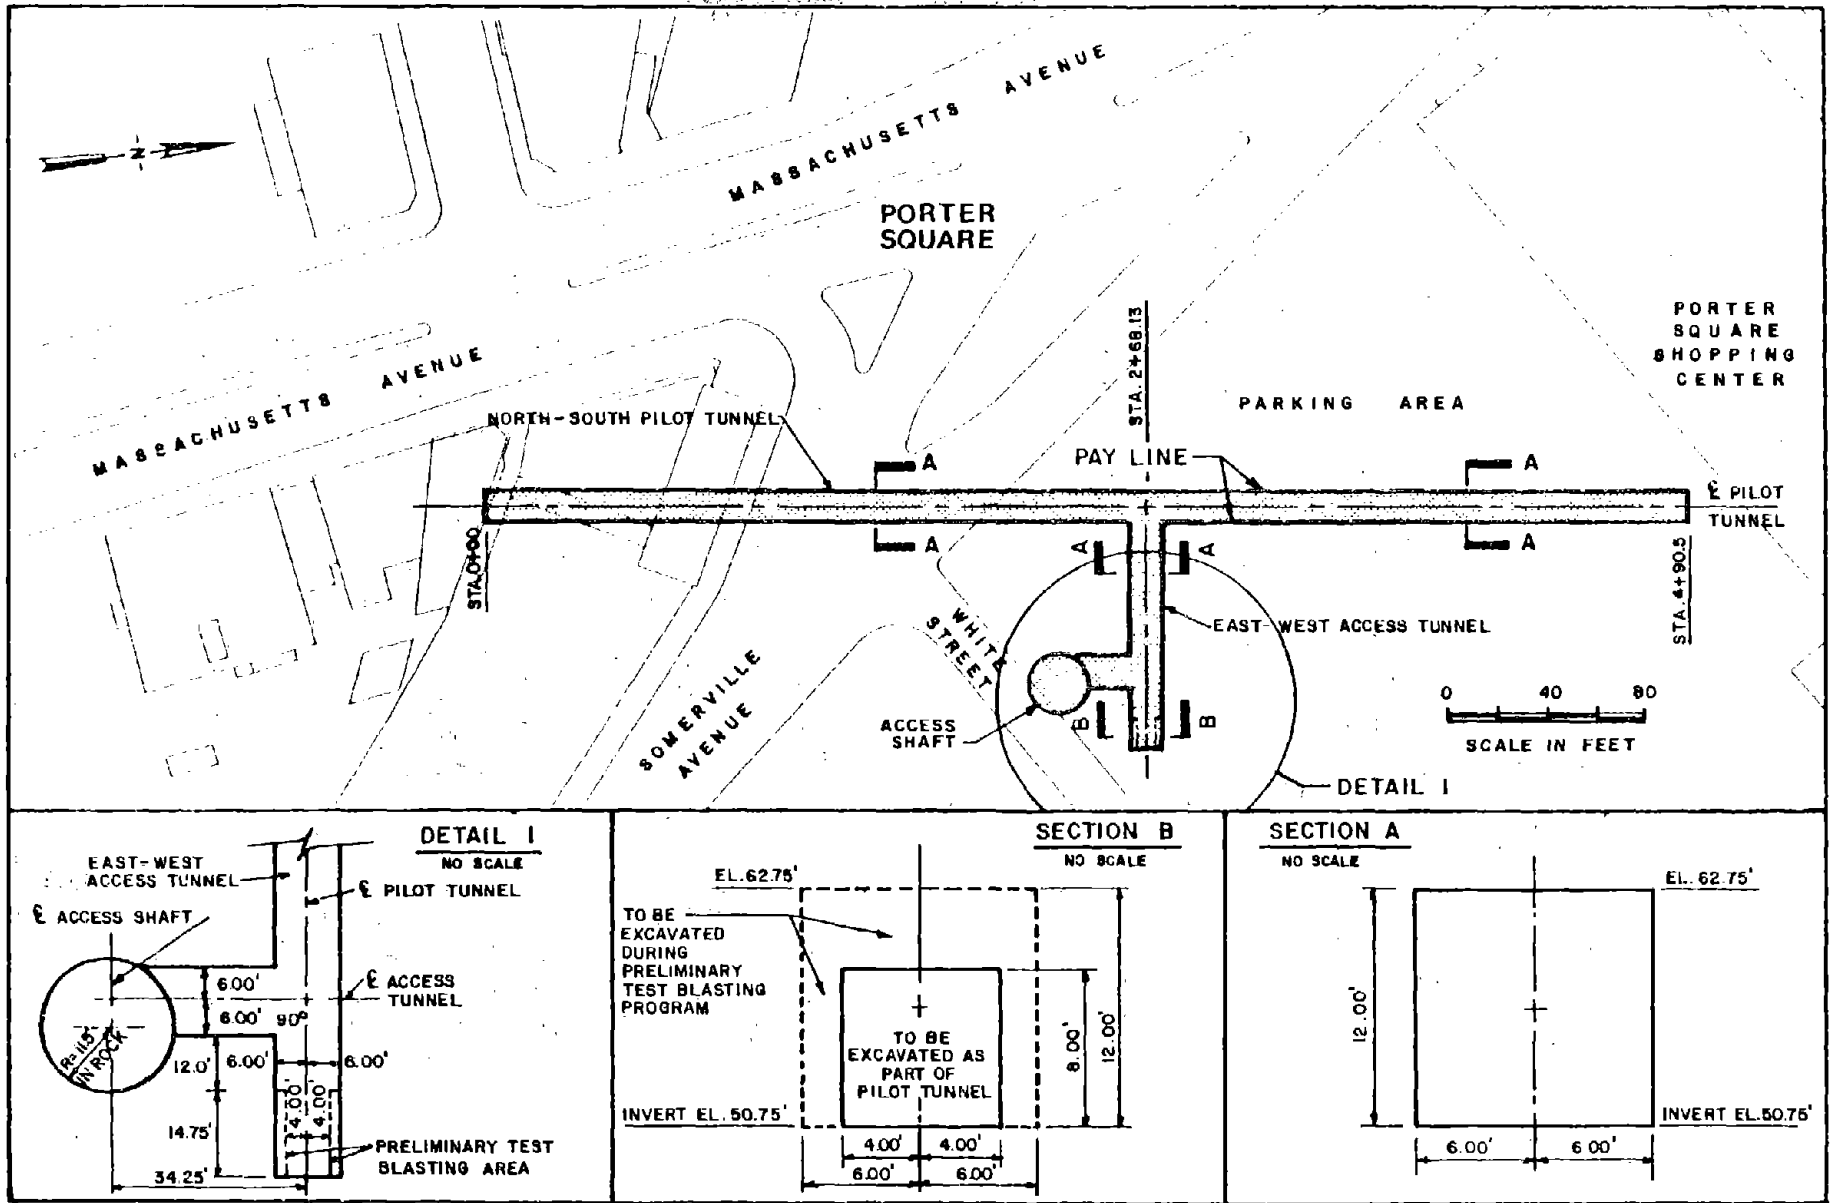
PILOT TUNNEL ALIGNMENT PLAN AND DETAILS
